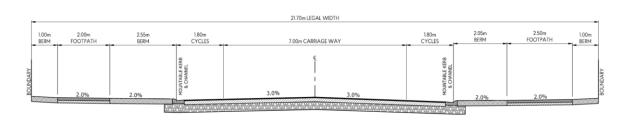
Typical Cross-Section (B) Collector - 21.7mwith Cycleway and Berm
